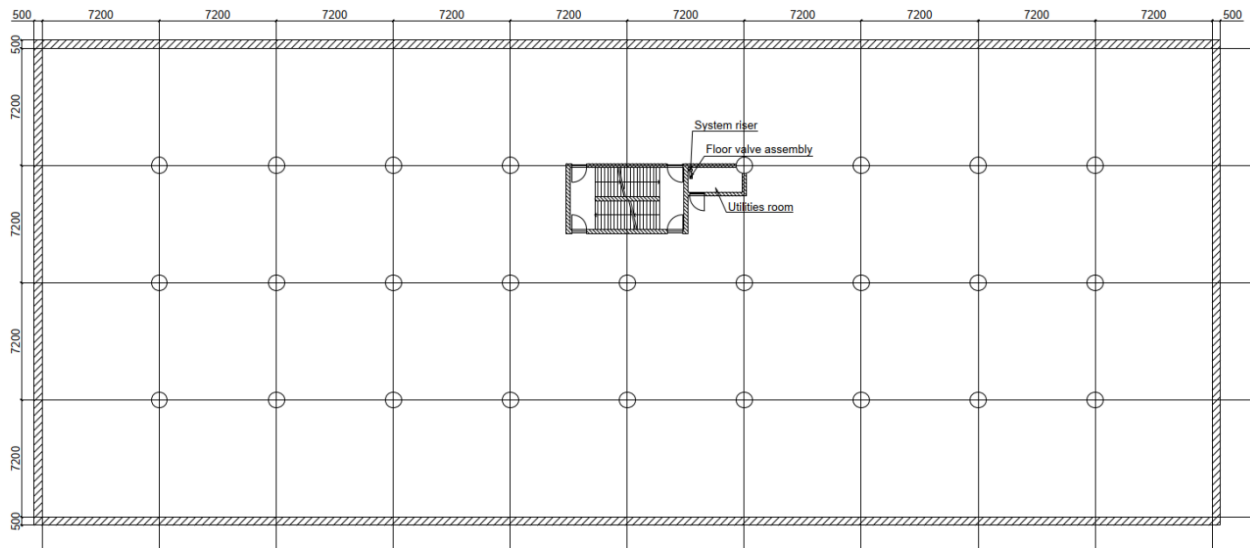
Basic floor plan of the mock building (enlarged version can be found in Appendix A2)
